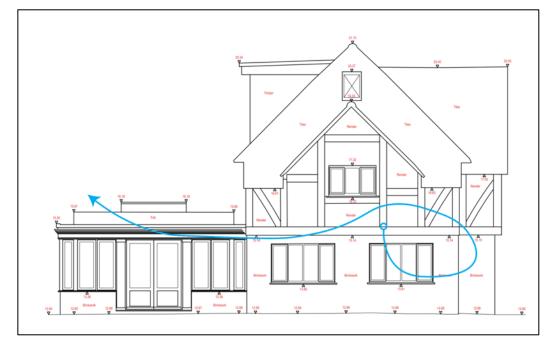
soprano pipistrelle bat emergence and flight path on the eastern elevation of the house.
